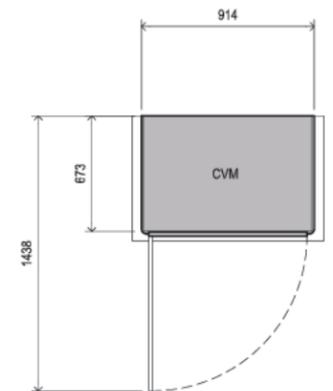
Typical Compass Vending Machine (CVM) Detail Plan
